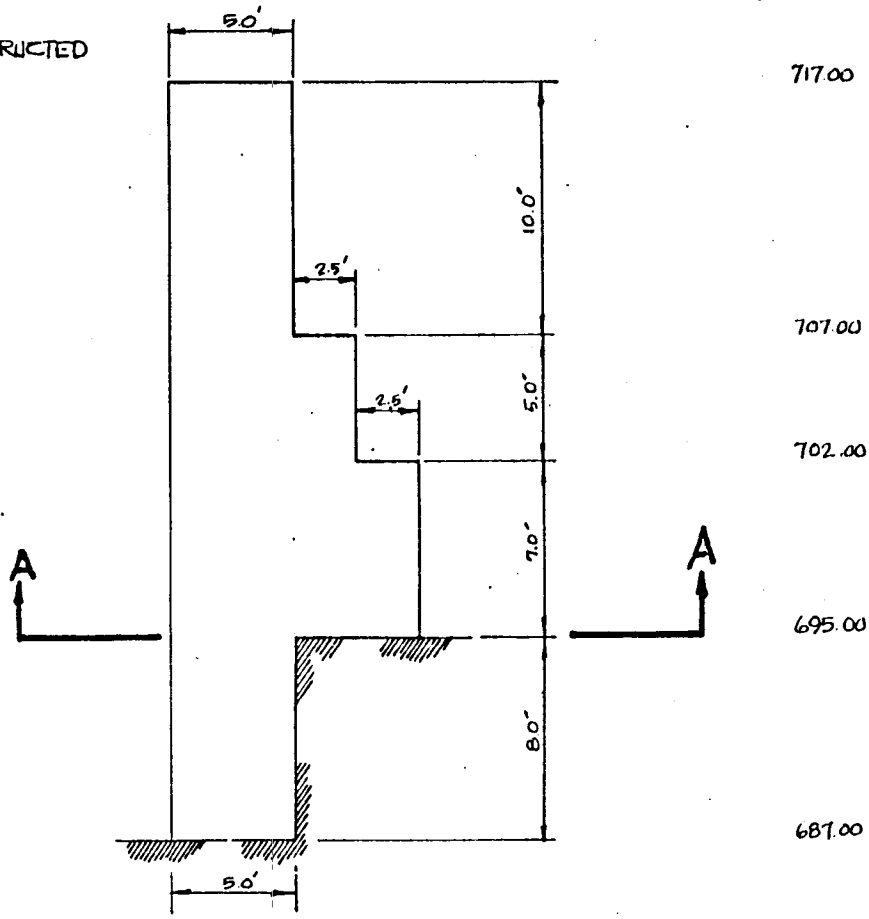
LANDWALL - UPPER GUIDE WALL MONOLITH L-19
